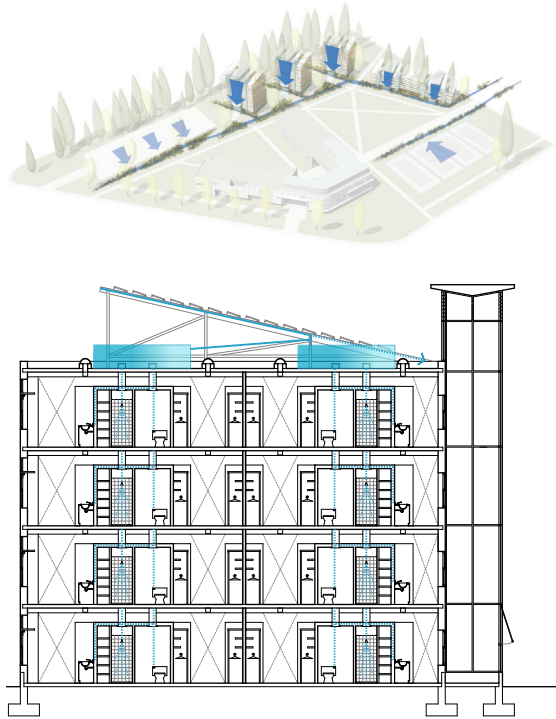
Site water management captures storm water runoff in bio-swales. Strategies at a building scale are represented in the building section.
